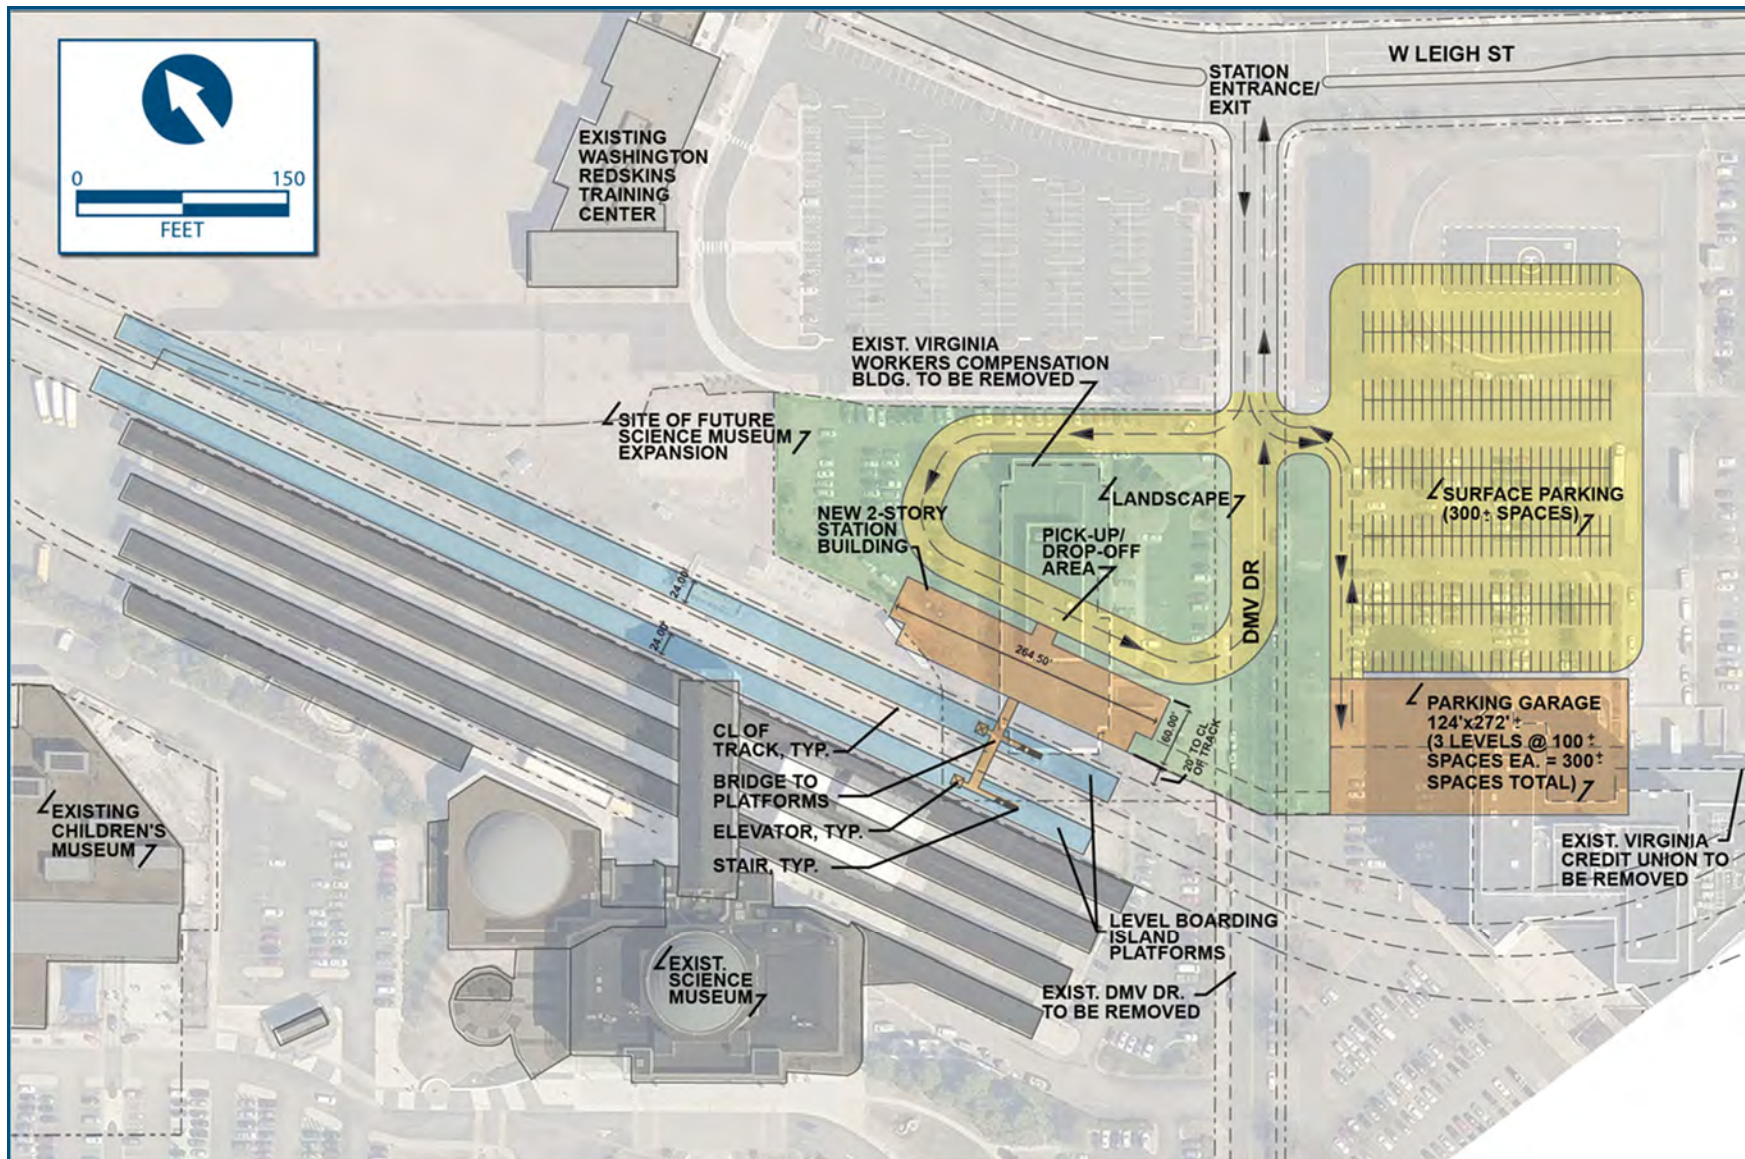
Broad Street Station Improvements for Build Alternative 6C
